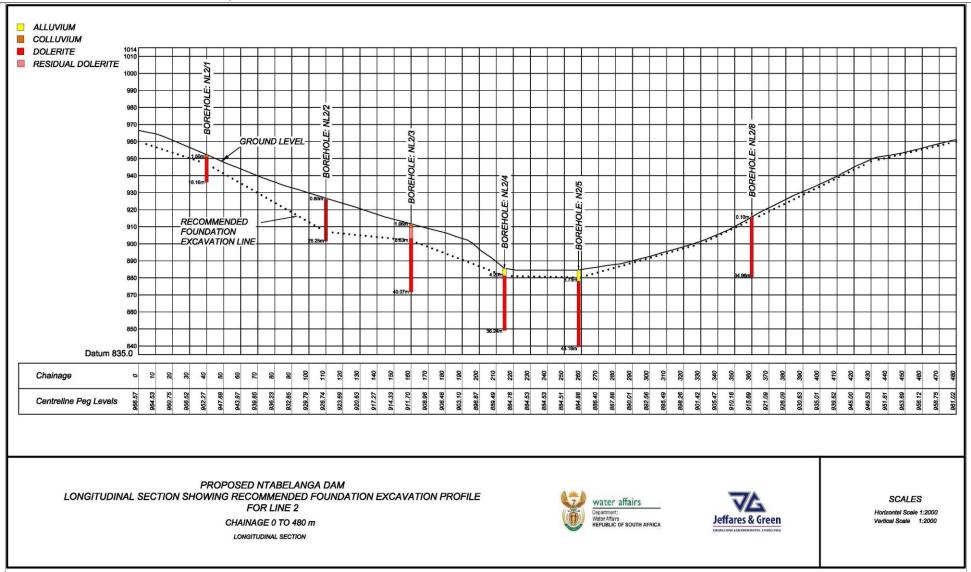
LS - Recommended Foundation Excavation Profile for Line 2
